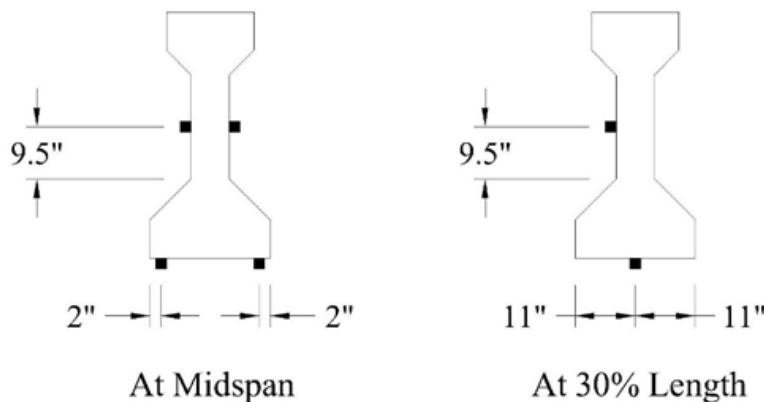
Strain transducer locations over beam height (Bridge 8588).
